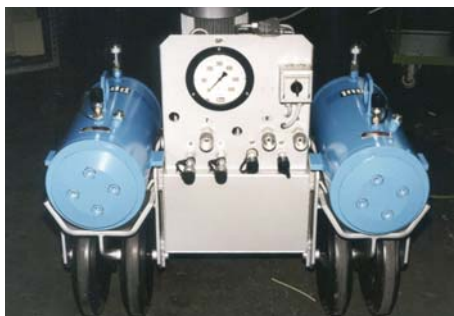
1500 kN/350 mm stroke double-acting detensioning cylinders with hydraulic pump unit
